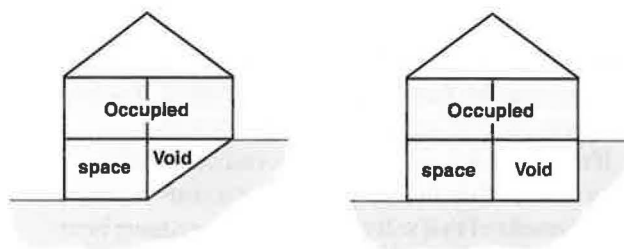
Voids beneath suspended upper ground floor in stepped construction
